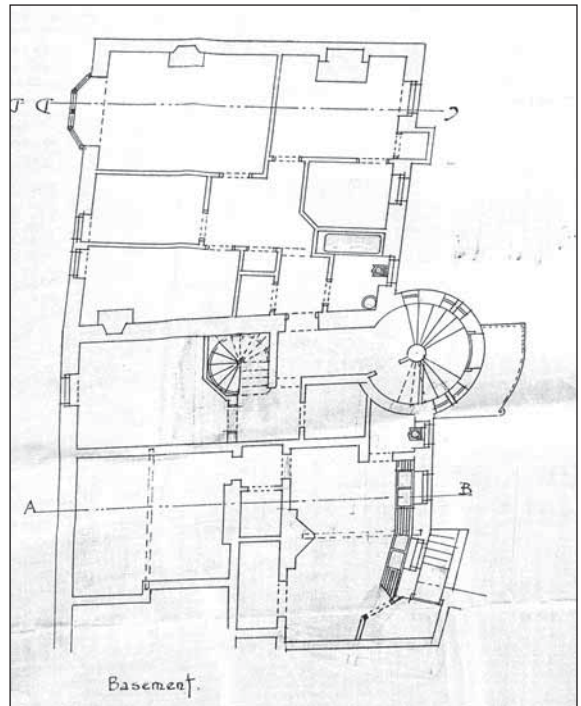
Basement plan of 'double tenement' in south west corner showing a small domestic dwelling and a utility area. These were shared between Pittodrie House and a small caretaker's dwelling. (ECA, Dean of Guild Plans, 11 June 1892.)
